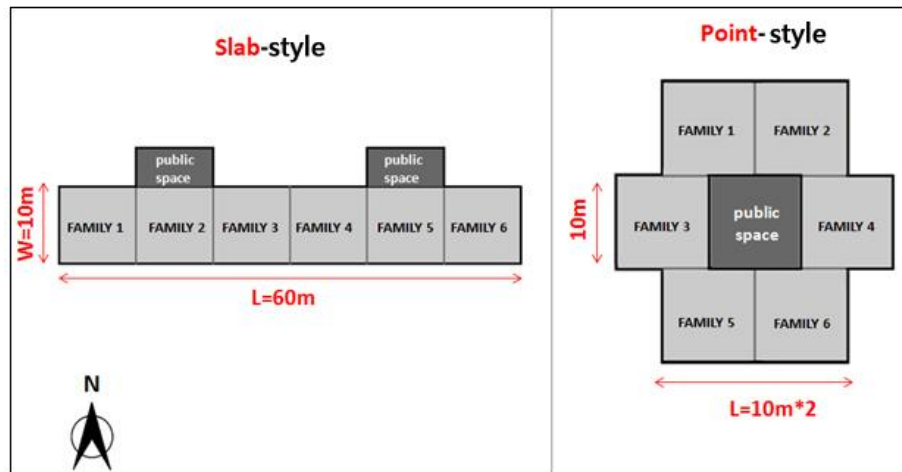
Floor plan of slab-style (left) and point-style (right)
